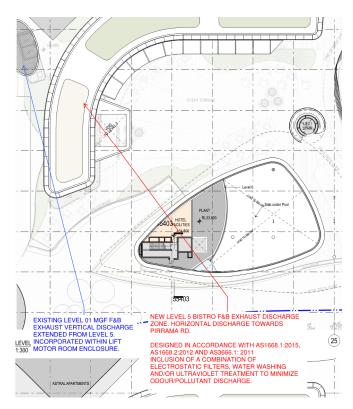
Level 06 Plan view - Existing Level 01 MGF F&B and Level 05 Bistro exhaust discharge location.
